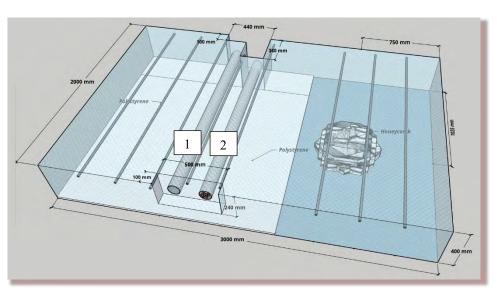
Geometry and dimension of test slab. 1) Empty duct. 2) Fully grouted duct.
